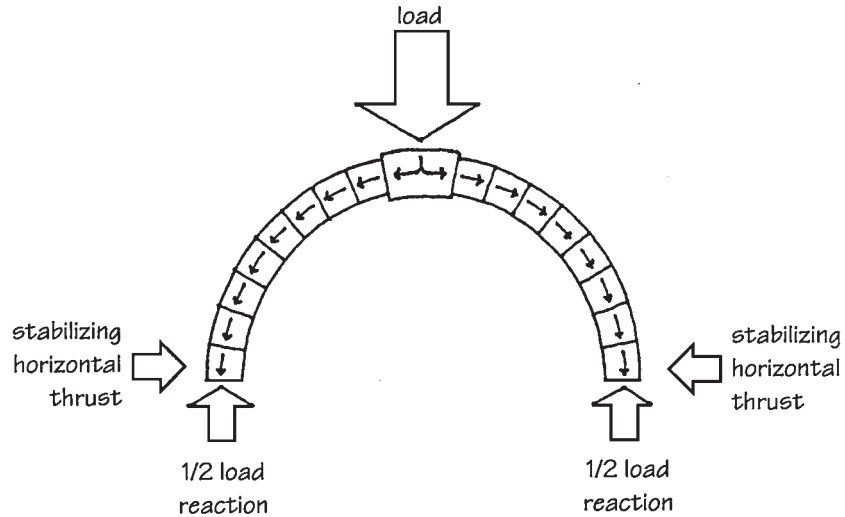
Load distribution in masonry arches. (From Beall and Jaffe, *Concrete and Masonry Databook*, McGraw-Hill, New York, 2003.)
